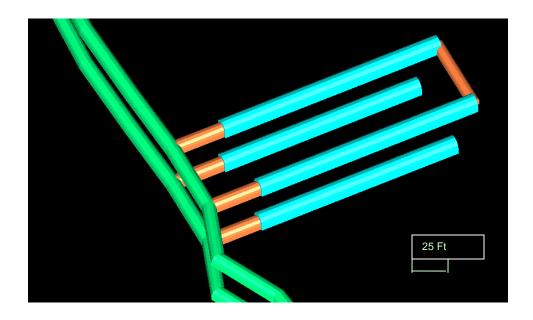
Blasting the Slot in the Hanging Wall Side of the Stope
